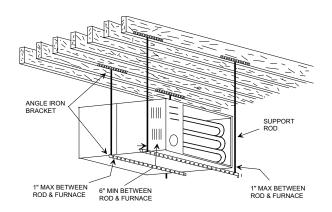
TYPICAL FURNACE INSTALLATION USING SUSPENSION MATERIALS
